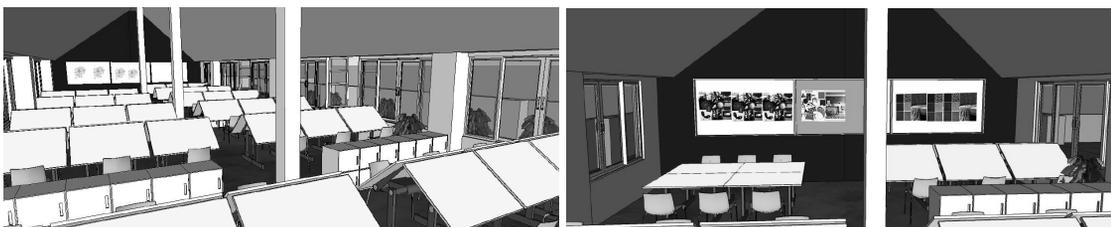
Interior Perspective AR-508 (Floor 5) studio type 3. Design circulation of central studio and locker between of workspace
